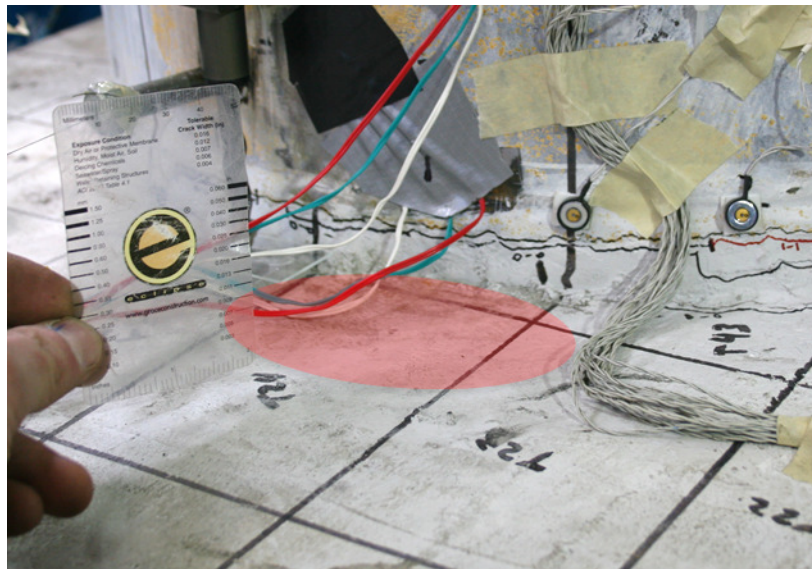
Approximate size and location of cap beam spalling.
